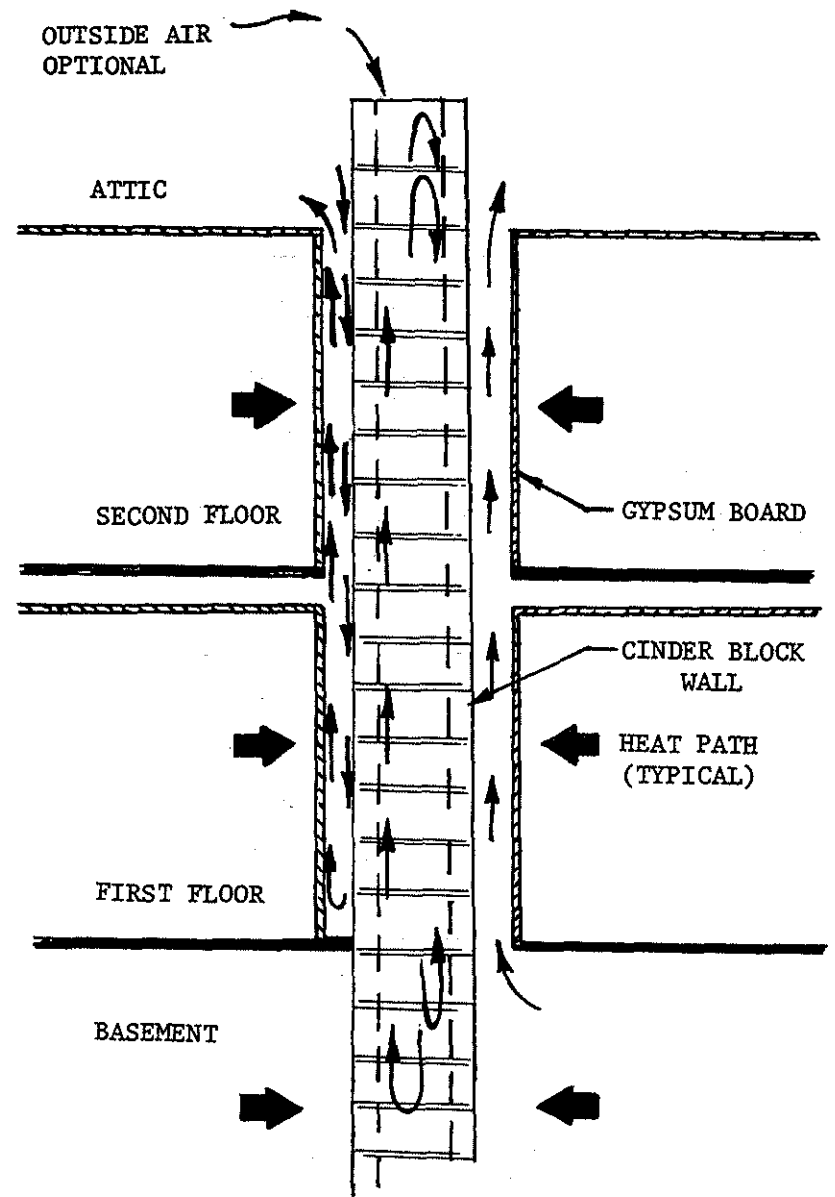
The party wall; convective loop flow in wall and between wall on interior construction
